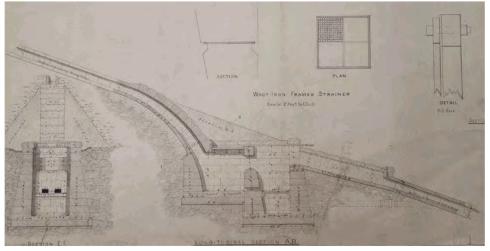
Excerpt from undated (c. 1883) plan for Pipe Head Well TMAG 18800/148 HCC -563-00
